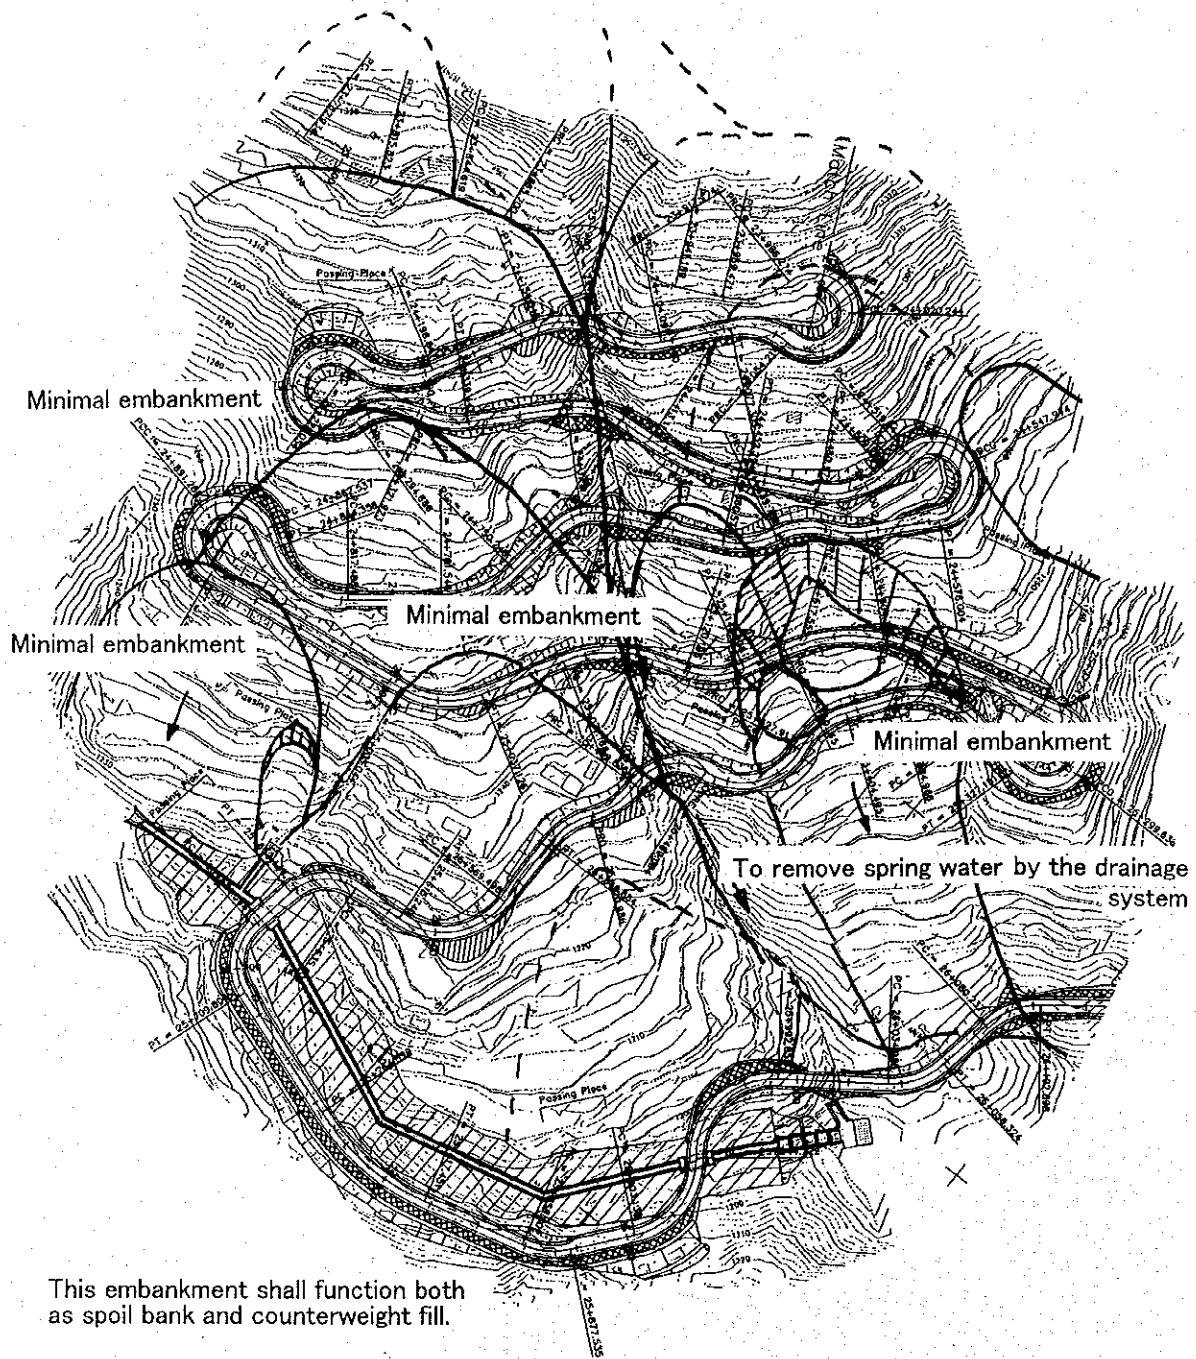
Road Plan in Sutarchhpadada Area
